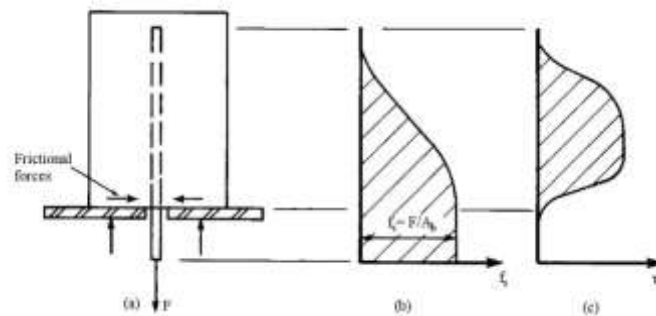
(a) Typical pull-out test method (b) Pull-out bar stress profile (c) bond stress profile (after [92])
